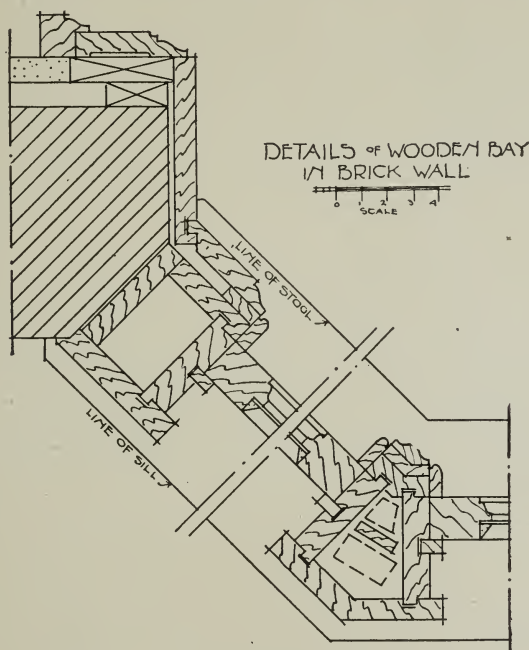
Detail of Wooden Bay in Brick Wall.
